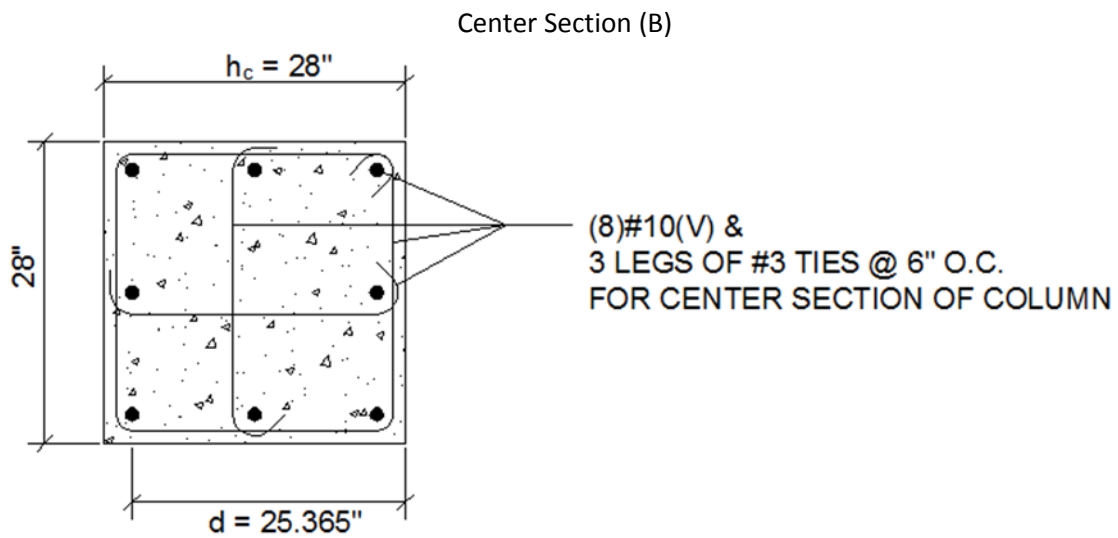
Exterior column, cross-section at center of column at ground floor level based on SDC D design.
